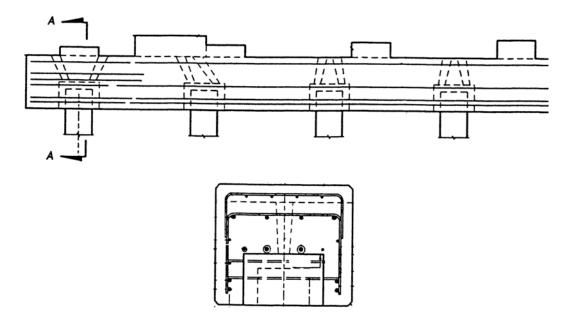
Florida DOT Rectangular Precast Bent Cap for Pile Bent [1.23]
